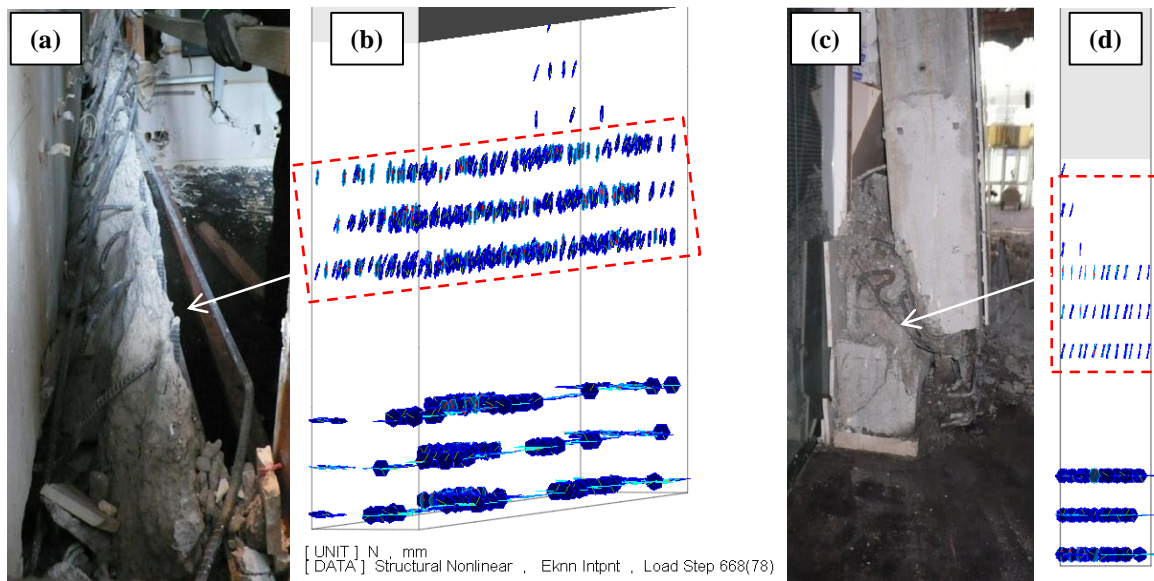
Crack pattern of wall D5-6 under out-of-plane uni-directional loading (a & c) February 2011 earthquake (Dunning Thornton 2011), (b & d) 3D and side view of the cracks in DIANA
